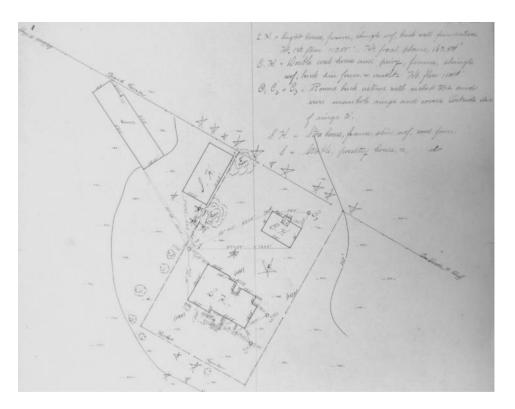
1893 topographic survey of Point Fermin Light Station, with lighthouse (L.H.), coal house and privy (C.H.), store house (S.H.), stable (S), and three cisterns (C1, C2, C3) shown. Note the picket fence around the lighthouse does not correspond with the Lighthouse Fence (#18) today, except along the north property border. Source: National Archives, courtesy of Point Fermin Lighthouse Museum.
